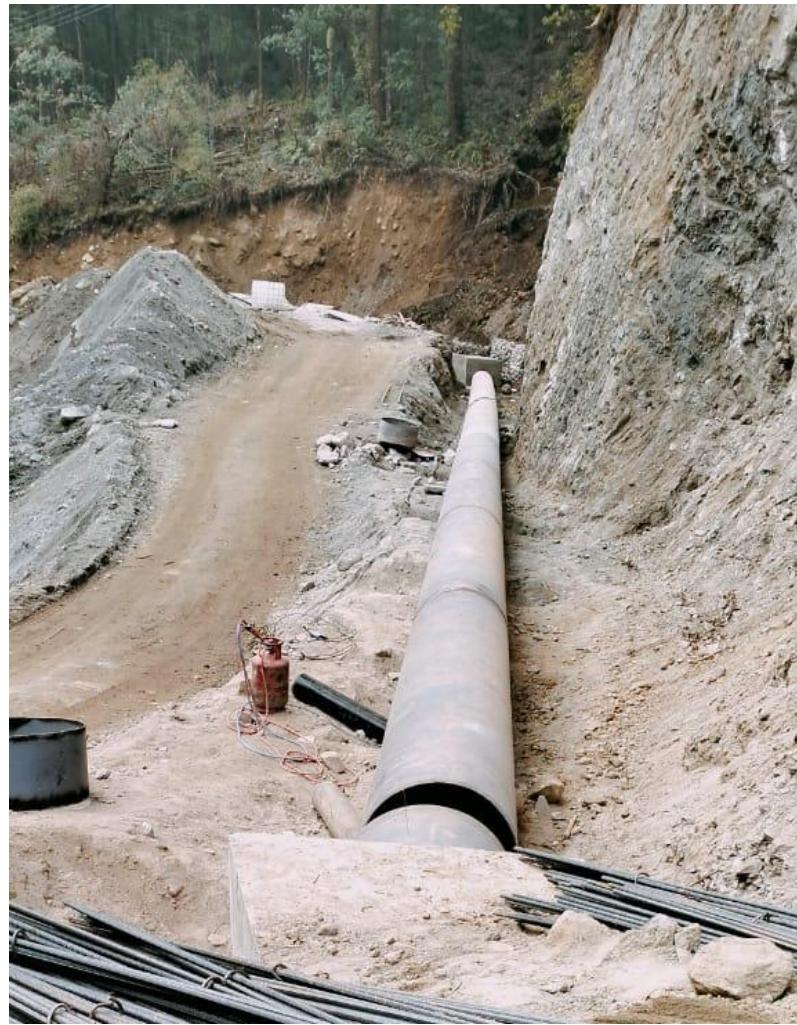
Headrace Pipe erection in between HAB09 and HAB08
